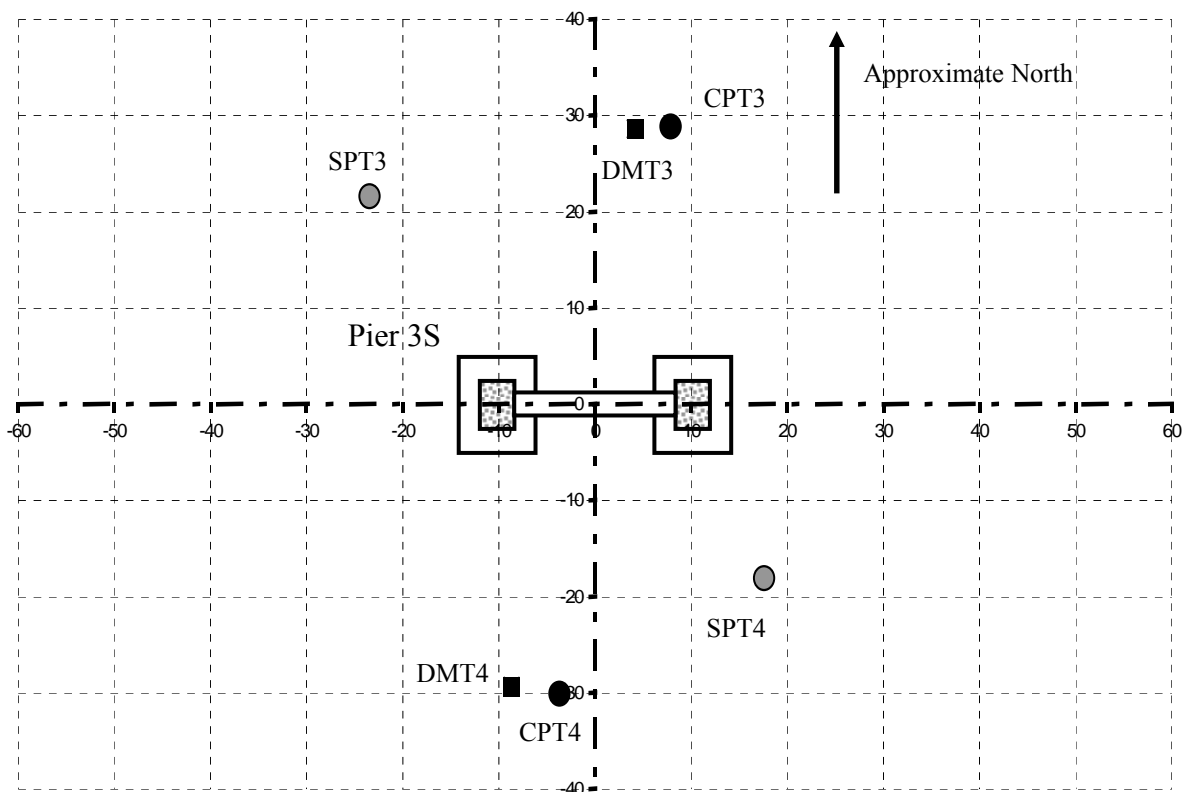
Location Plan for Pier 3S Borings, Soundings, and Instrumentation
